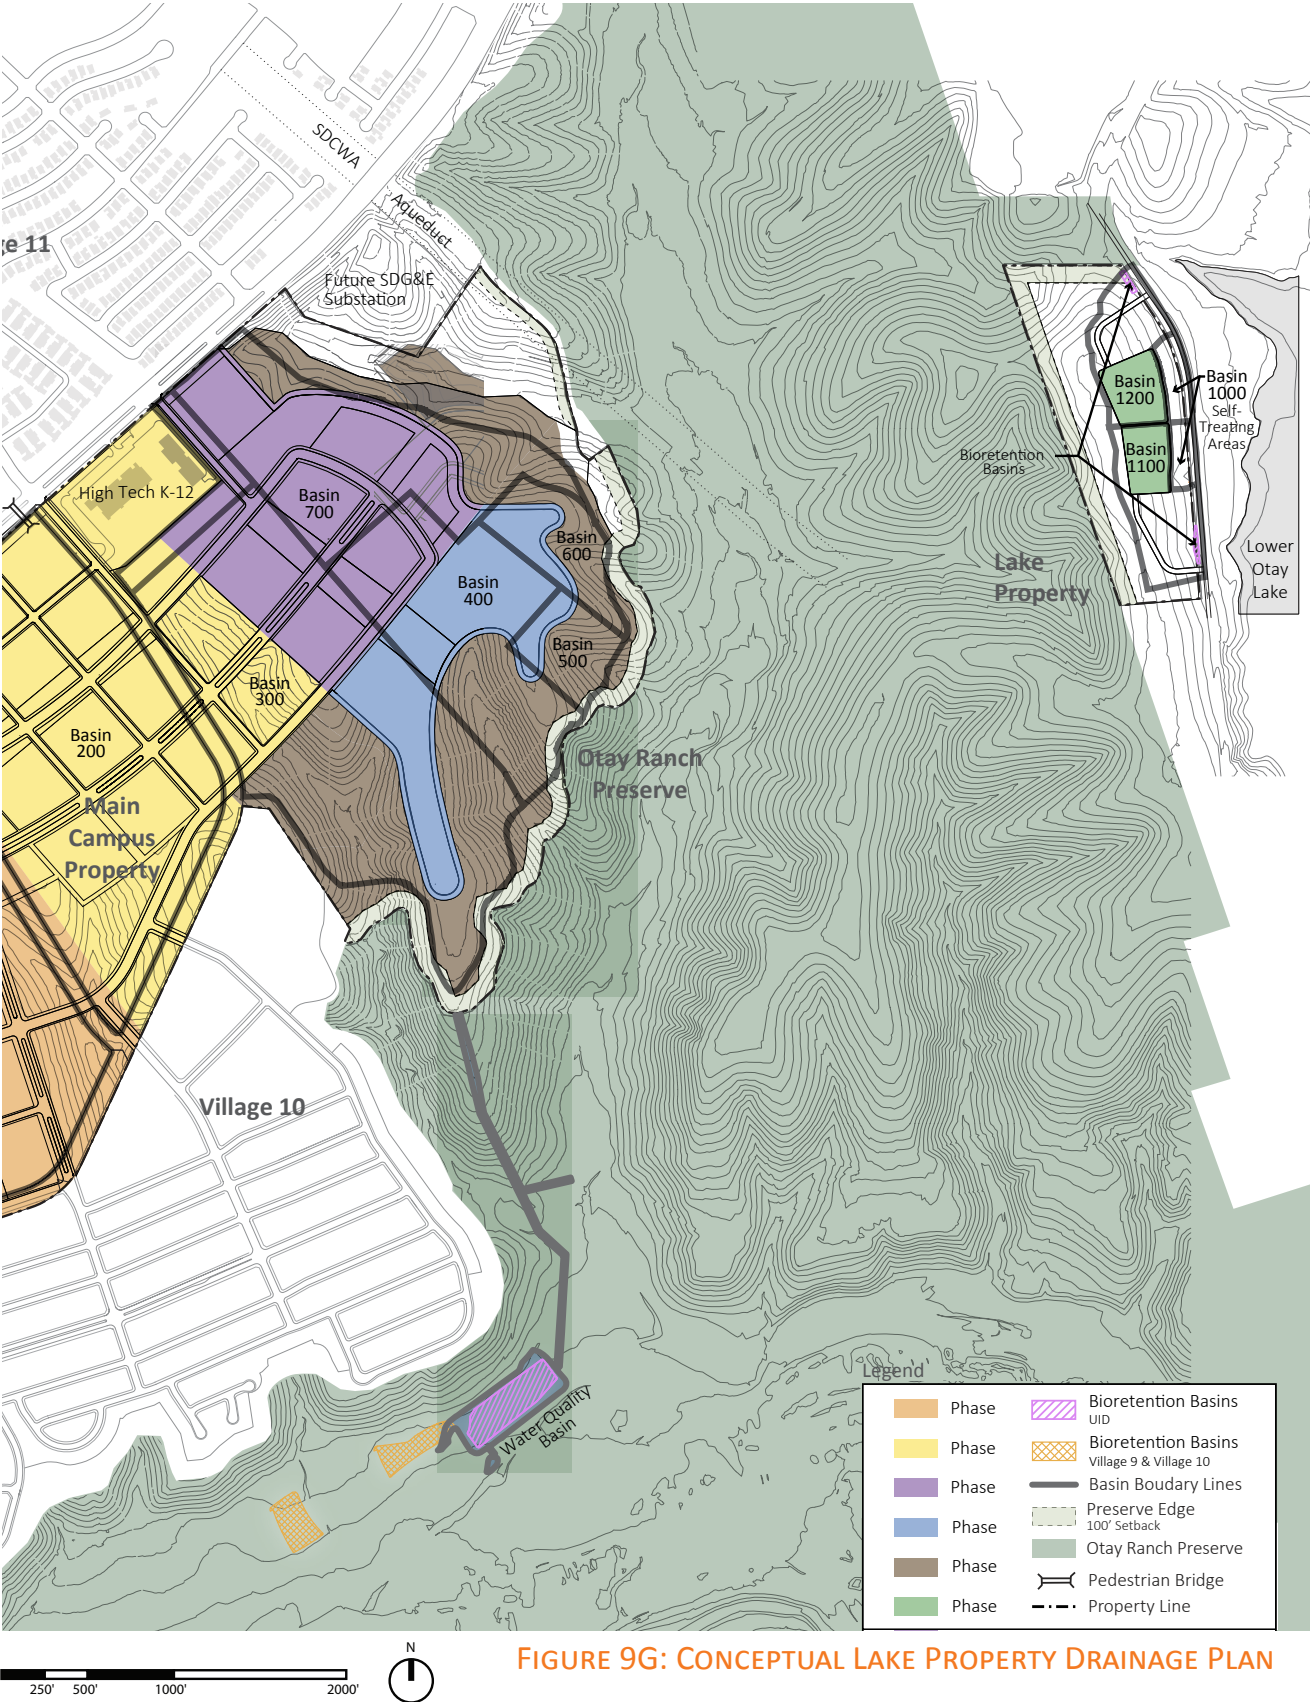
G: CONCEPTUAL LAKE PROPERTY DRAINAGE PLAN
